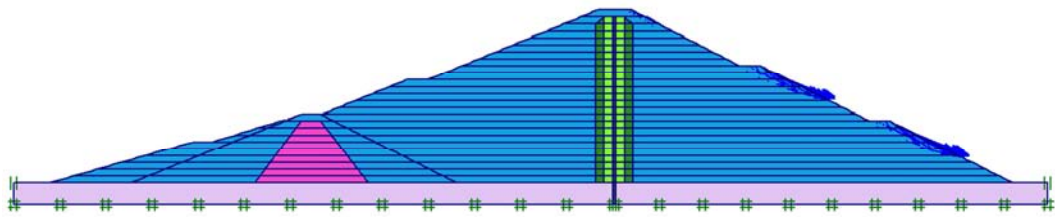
Possible failure surface of asphalt concrete core embankment dam (by arrow approach) (source: Plaxis Output).
